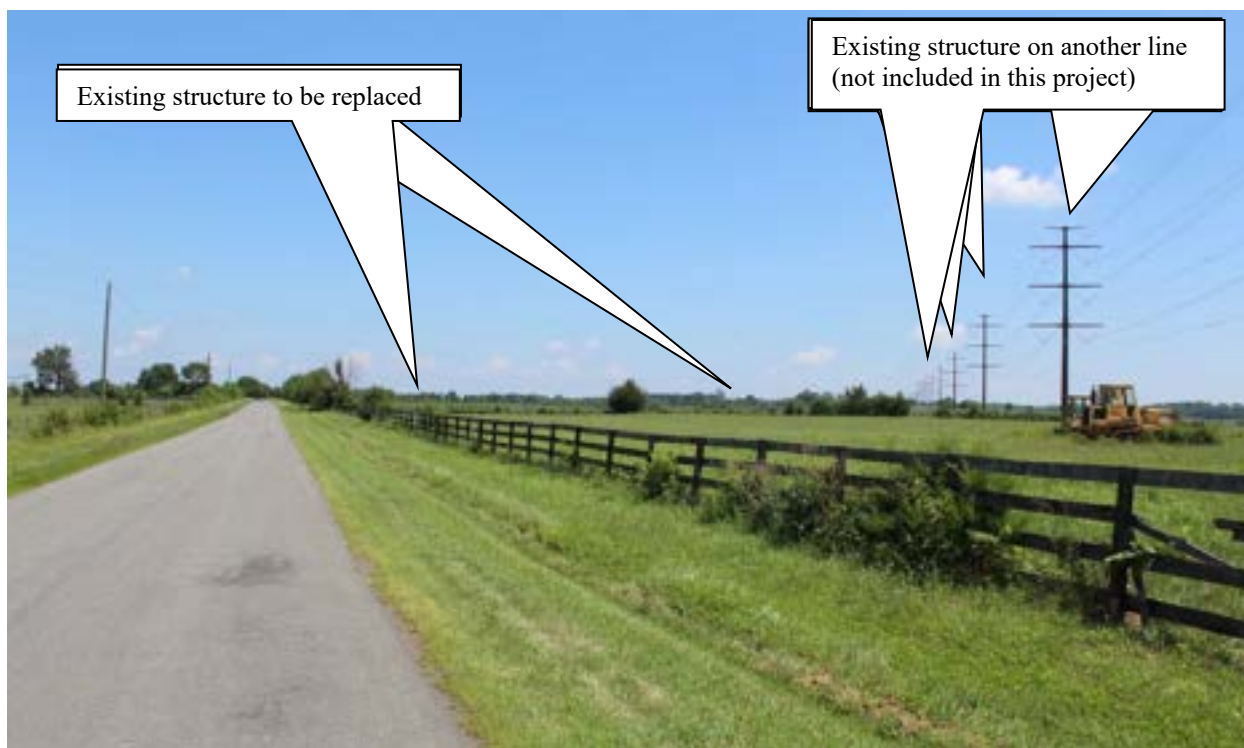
Photo location 10- View from Blackjack Road (Multiple existing project structures and structures on another line visible), facing northeast.
